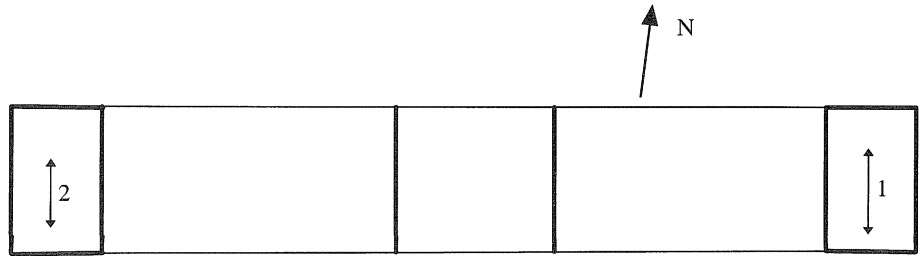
Plan of the building with position and direction of accelerometer 1 and 2 .
